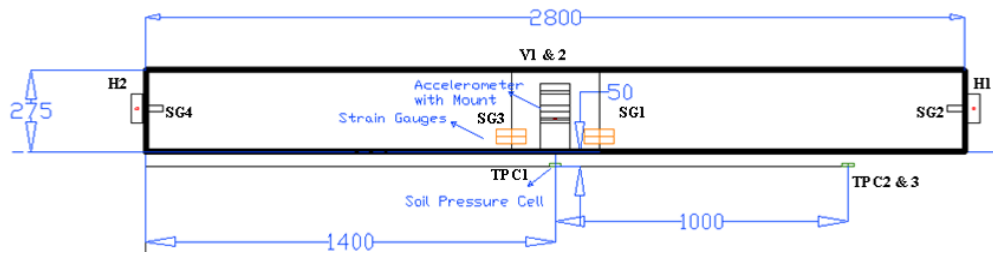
Instrumentation layout for Slab 2 (Front View)
